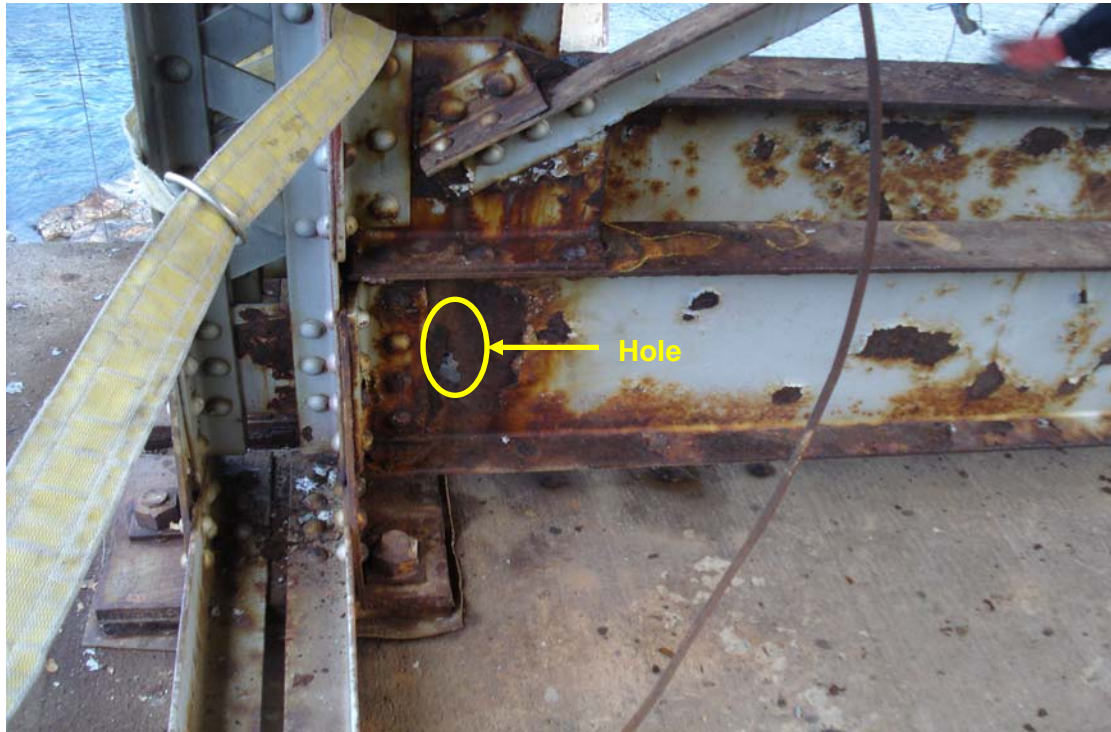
Hole in Span 1 Jacking Beam Web at Pier 1
